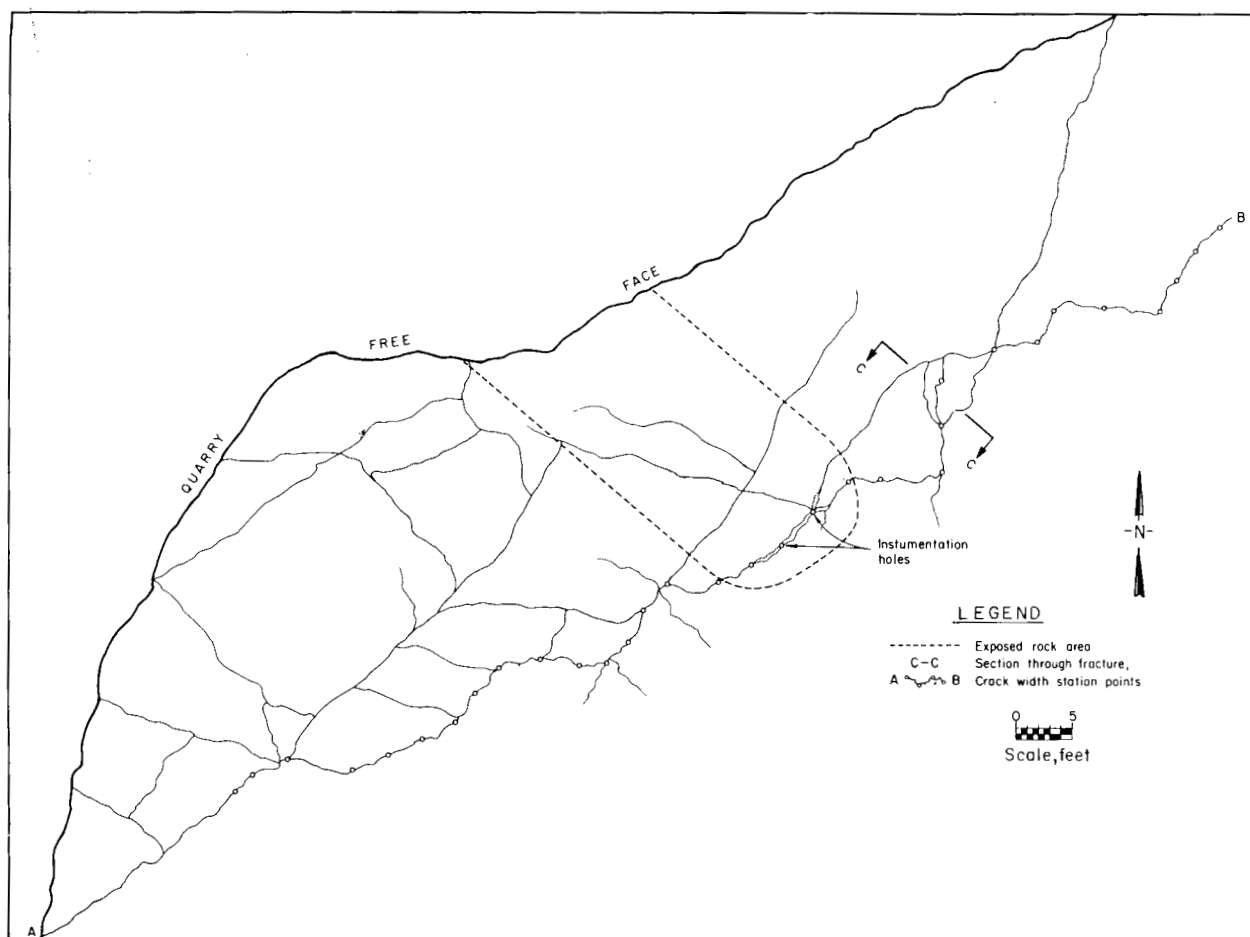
Surface view of cracks formed by explosive fracturing in Hogshooter Limestone Formation.
